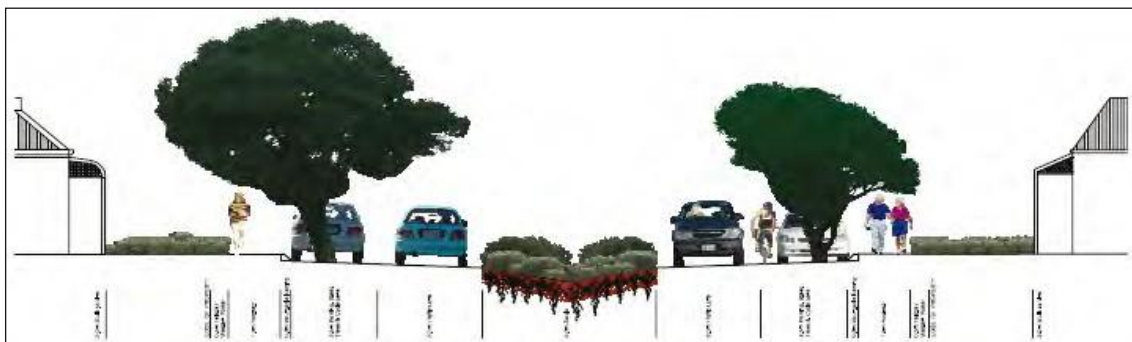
Swale concept plan from the Water Management Plan. (Source: MGA Town Planners 2003.)
